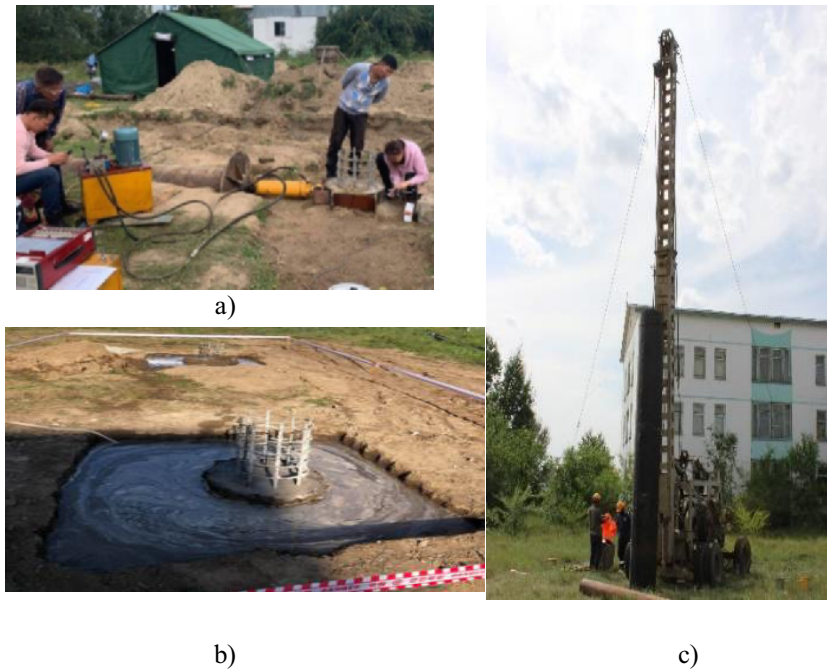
Testing stages: a) Displacement measurement; b) Soil damping; c) Casing pipe being installed.
